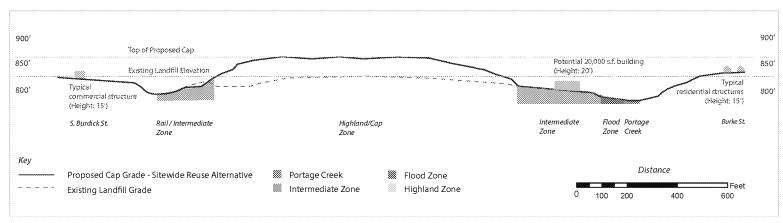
Site profile from Burdick Street (left) to Portage Street (right)
